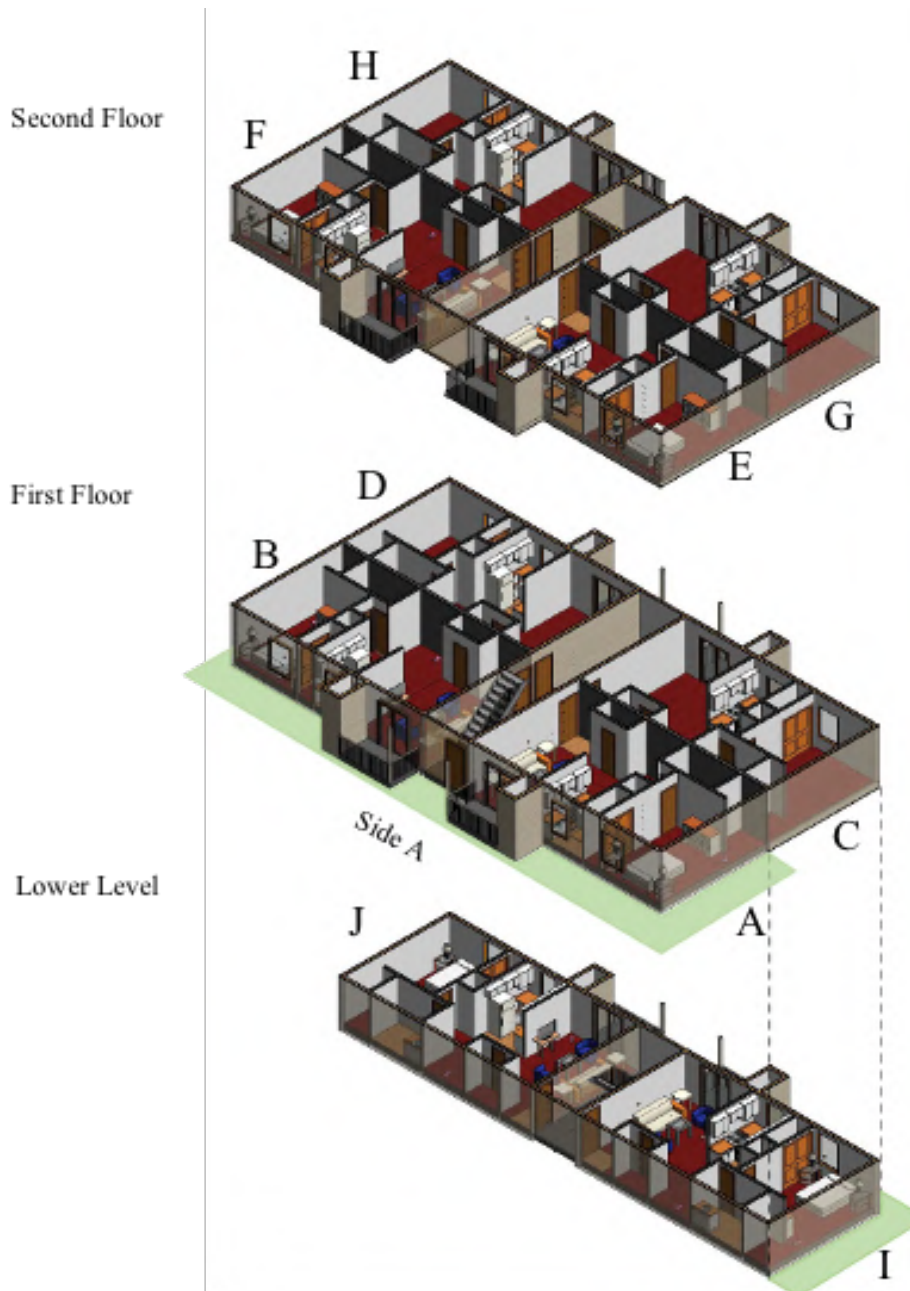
An isometric view of each floor from a CAD drawing of a building used in these experiments. The labels A–I indicate each apartment unit.
